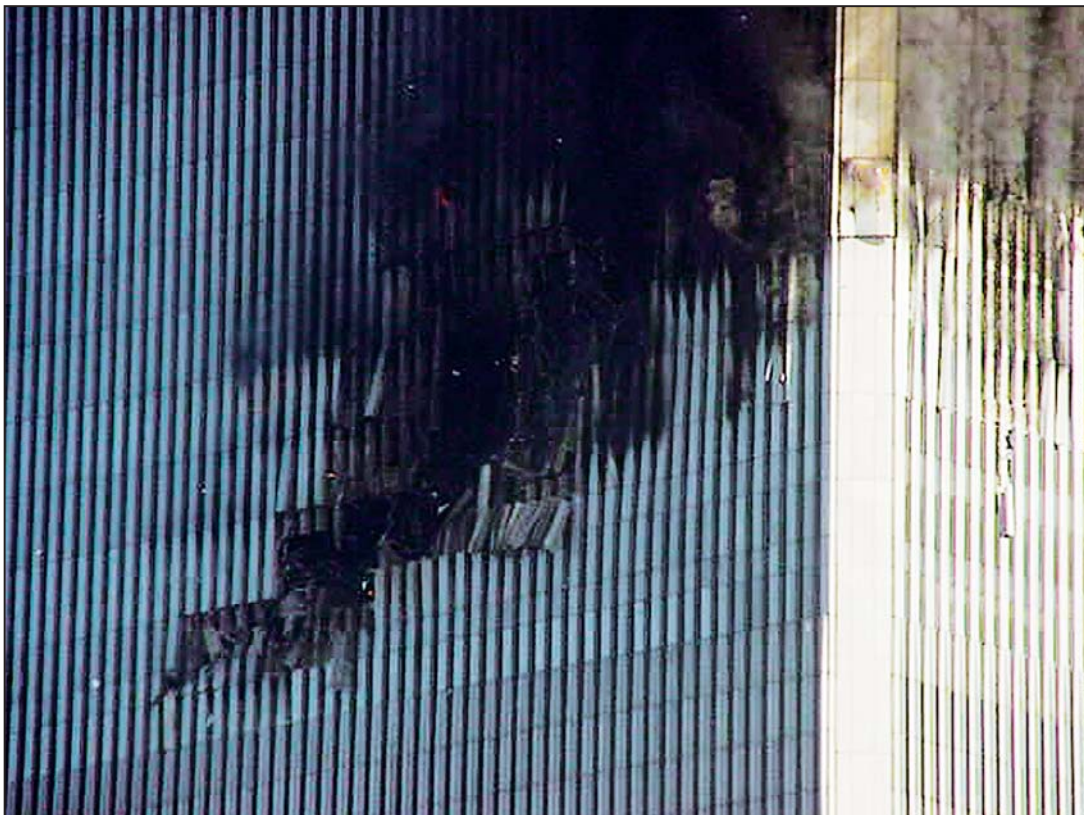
Southeast corner of WTC 2 shortly after aircraft impact.
